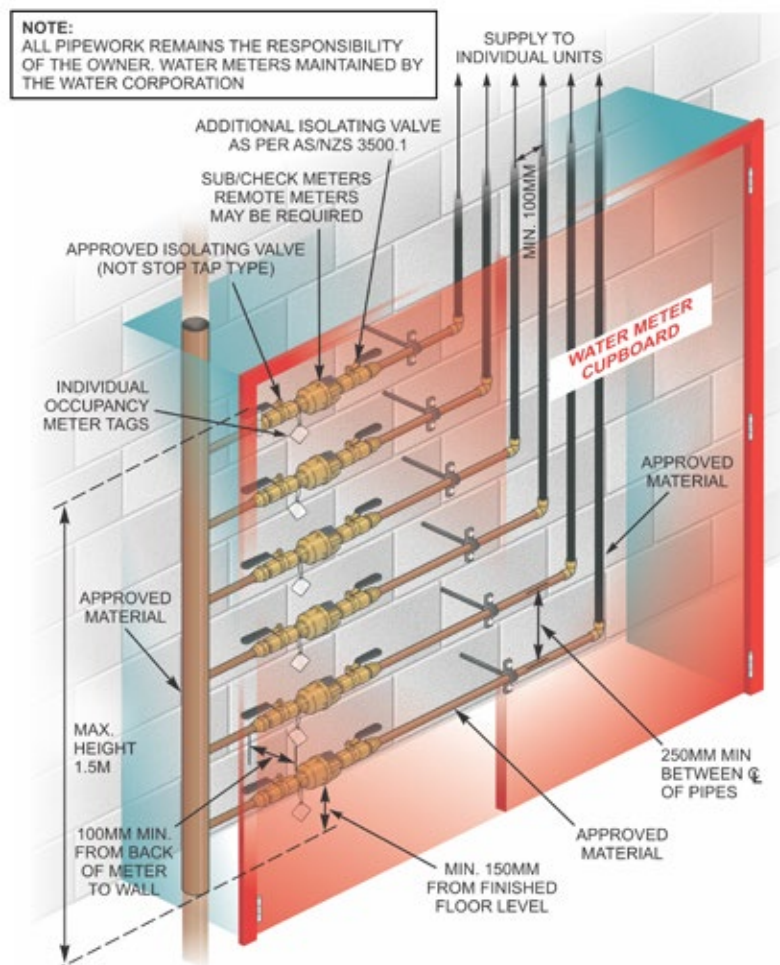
High Rise Sub/Check Meter Typical Arrangement
